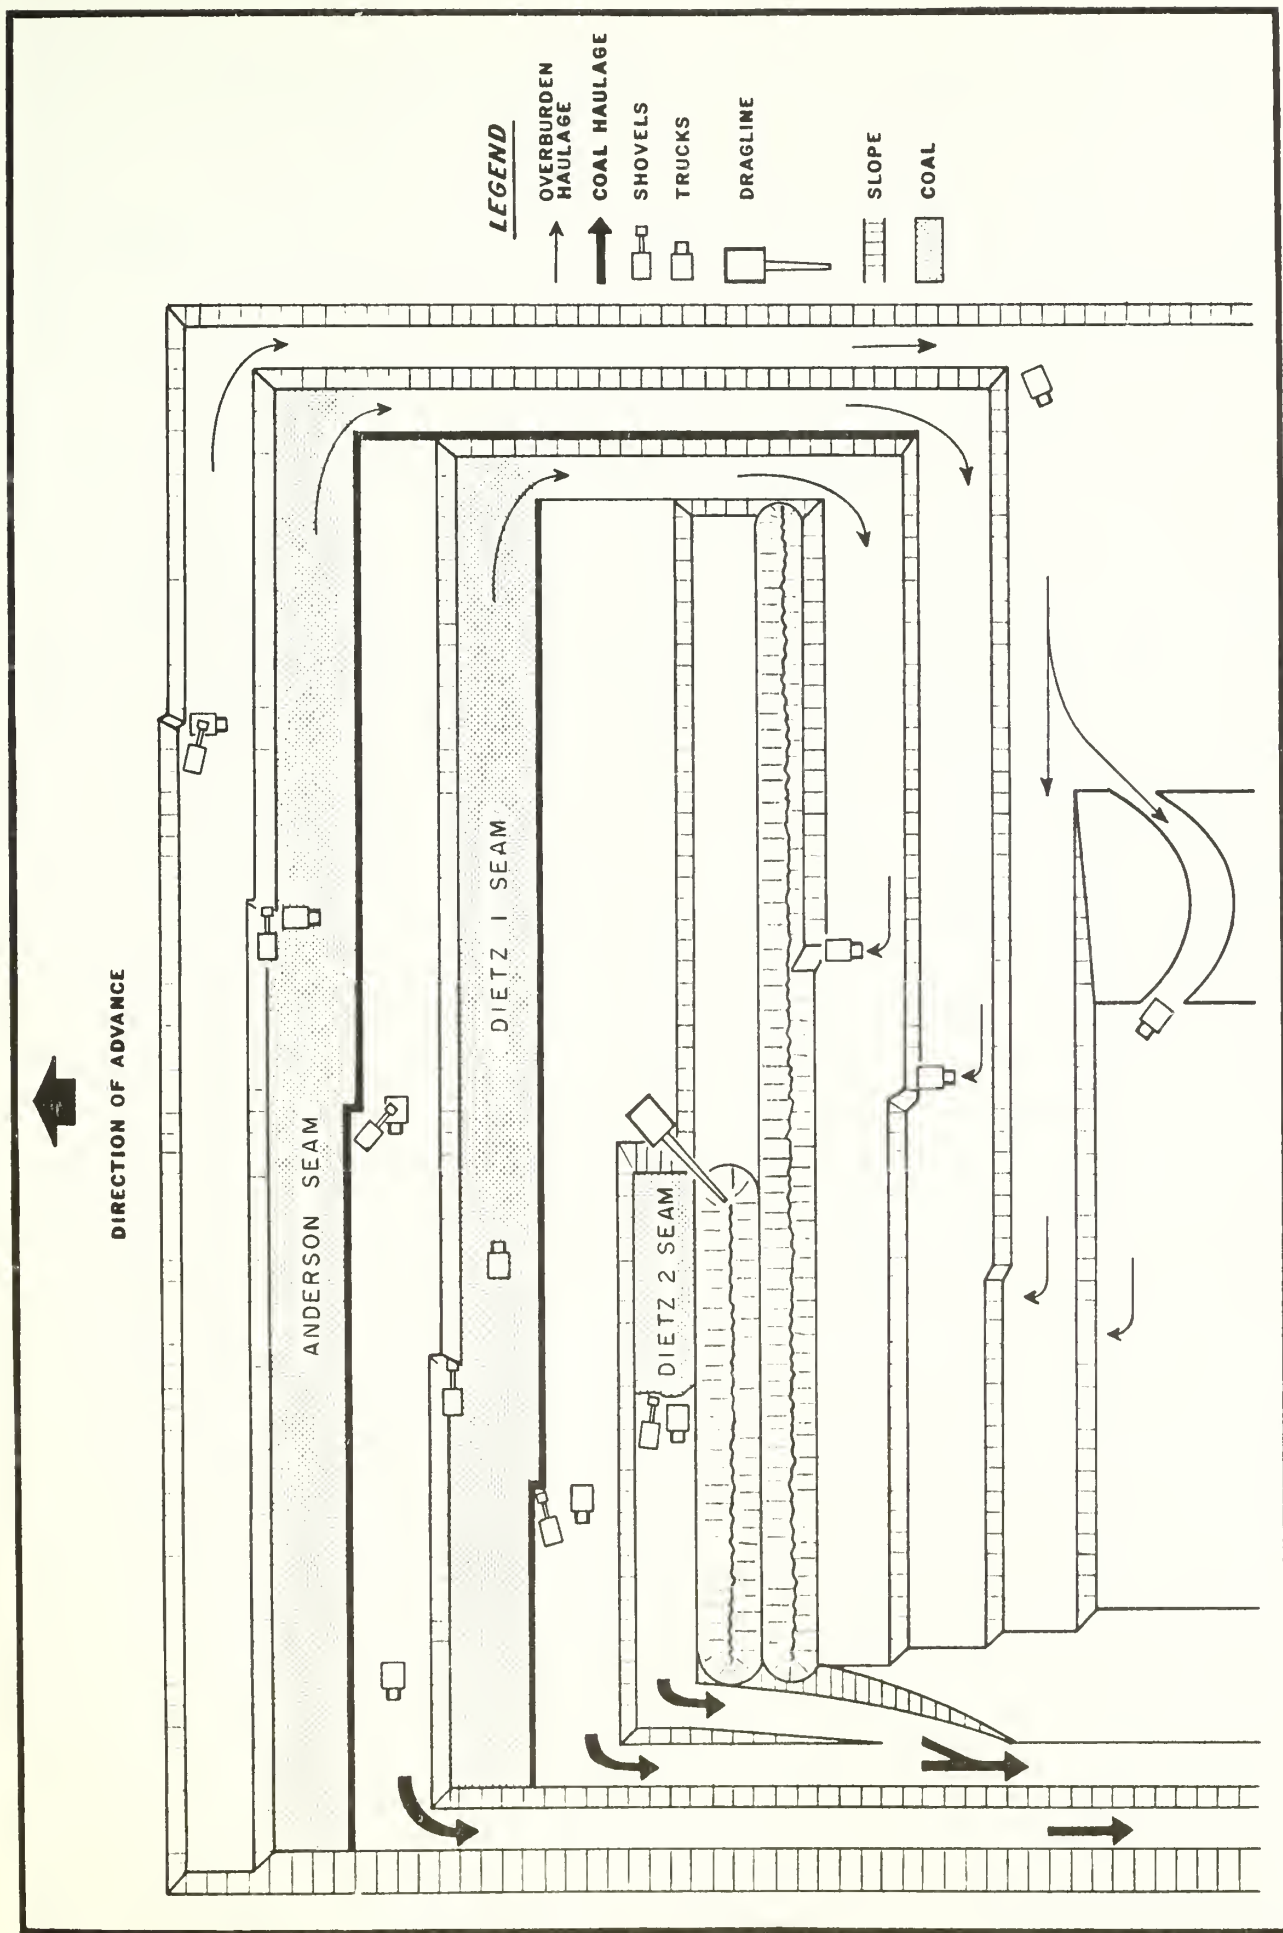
Schematic diagram showing plan view of method of overburden and coal removal and placement of spoils under Alternate Mining Plan B-3 in the East Decker area.
